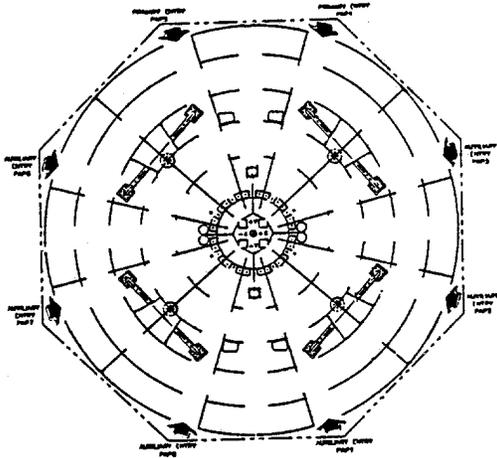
Cross section of cell structure showing personnel access hole arrangement
